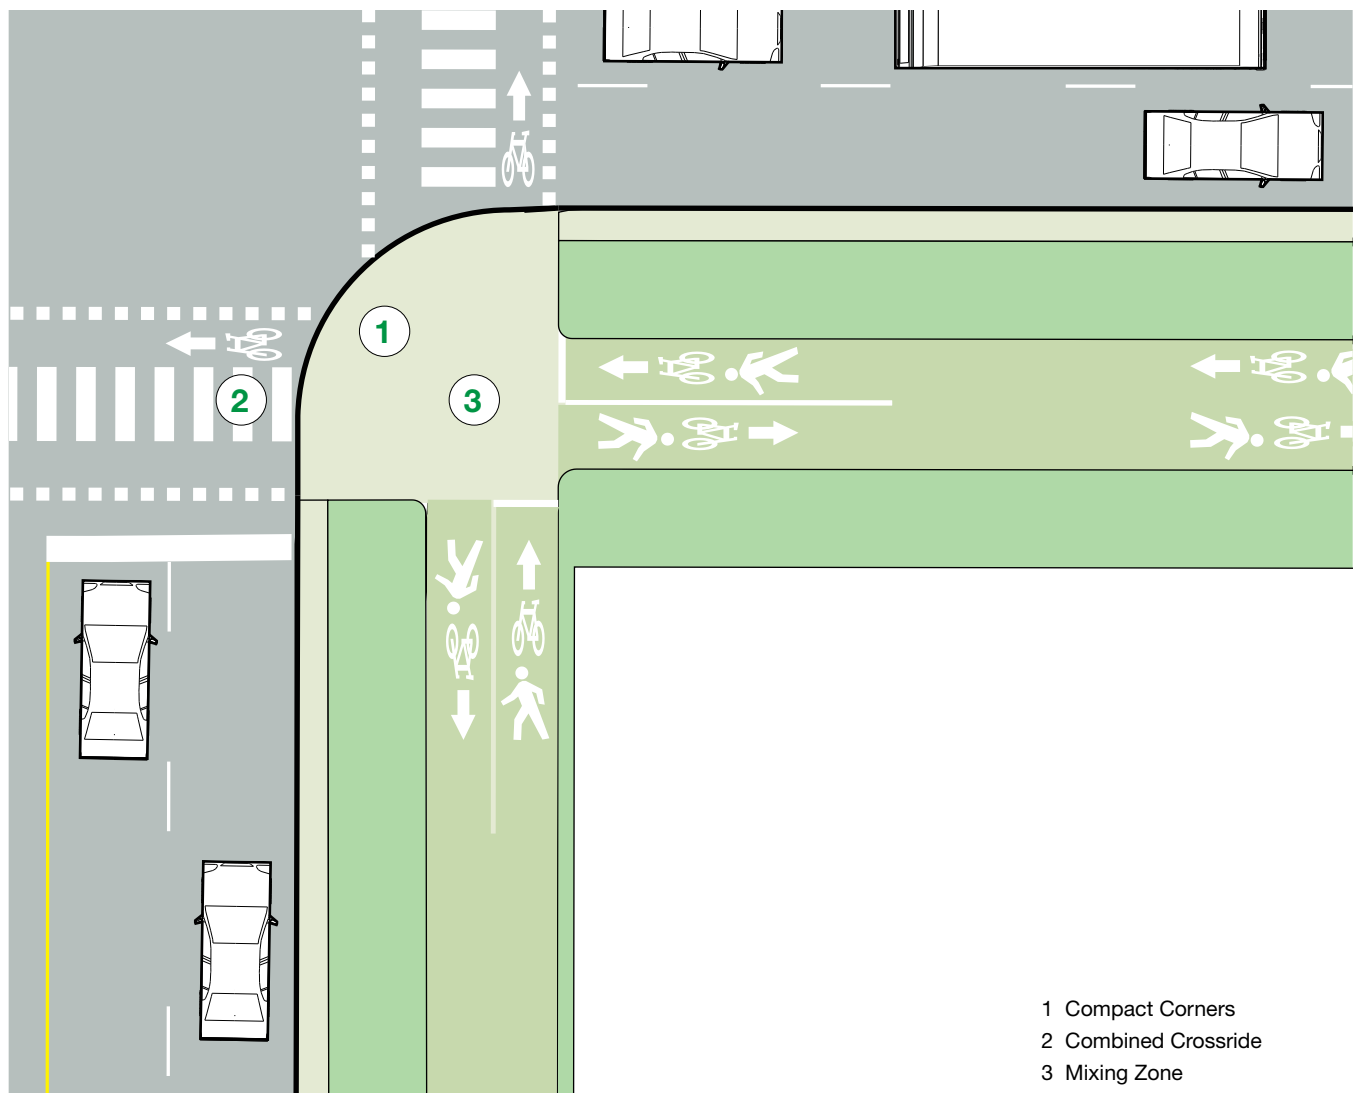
Example of an intersection of Collector and Arterial: mixing zone.
